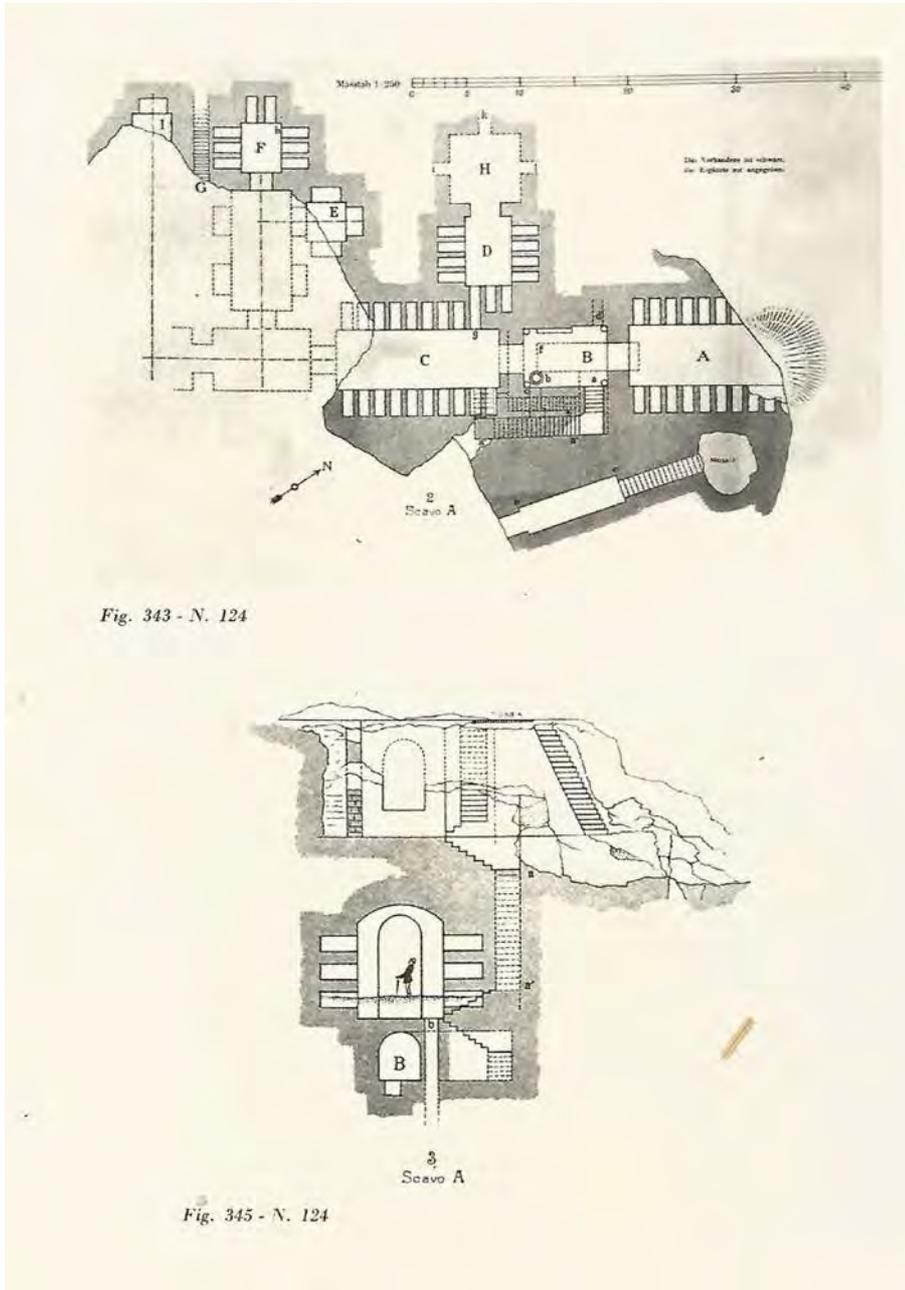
Plan and section through Scavo A; (Adriani 1966).
